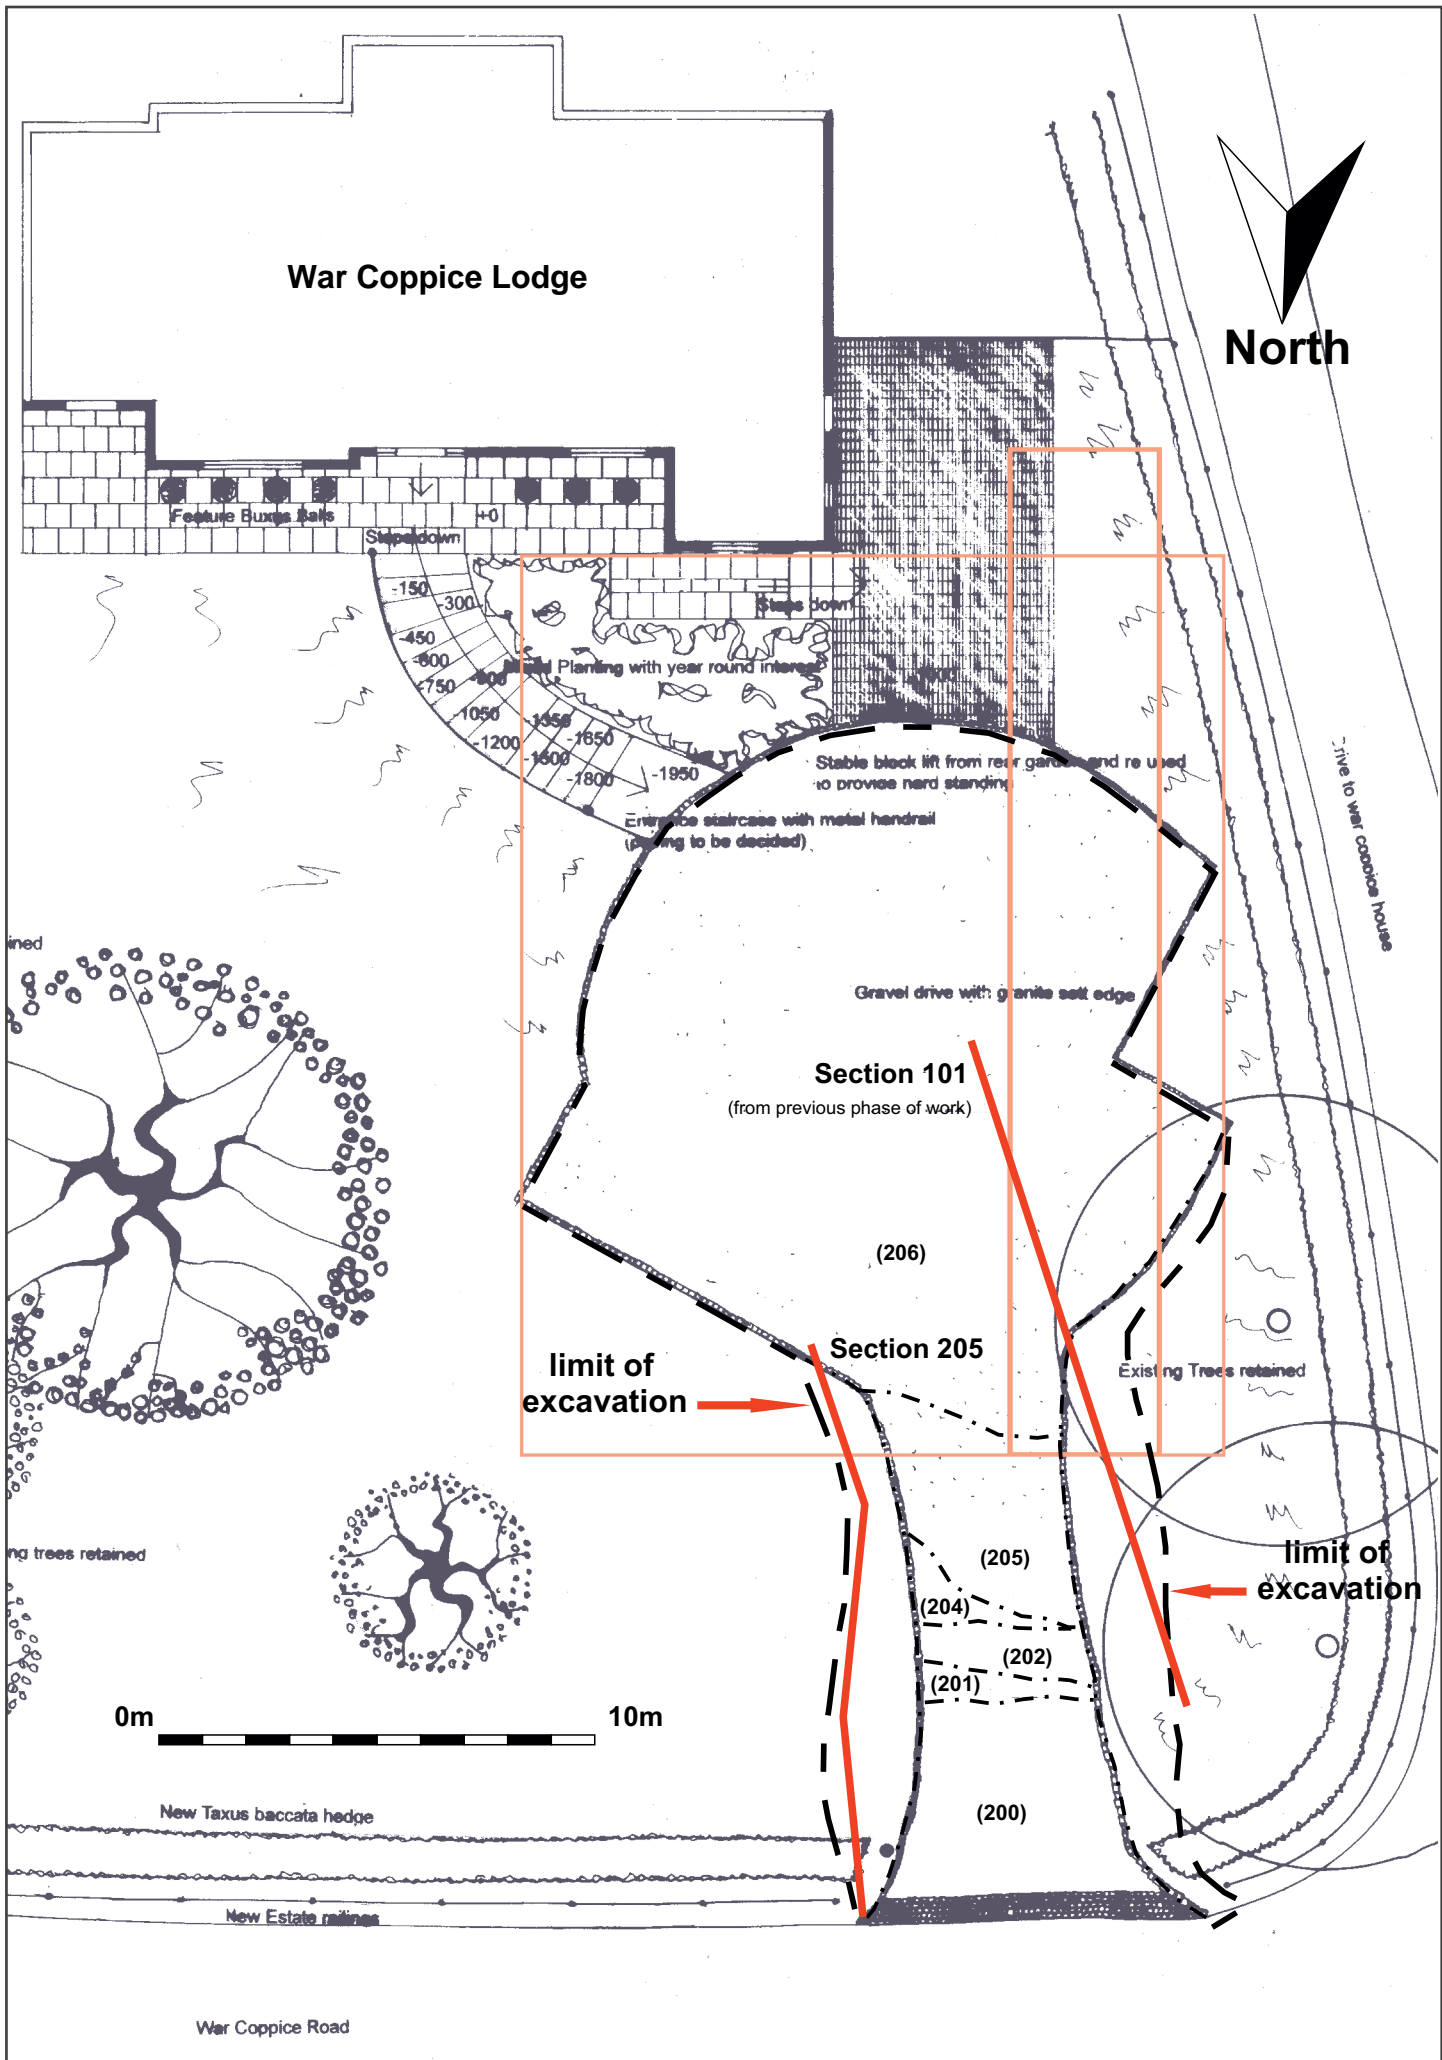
; War Coppice Lodge, Caterham. Trench and section location plan
